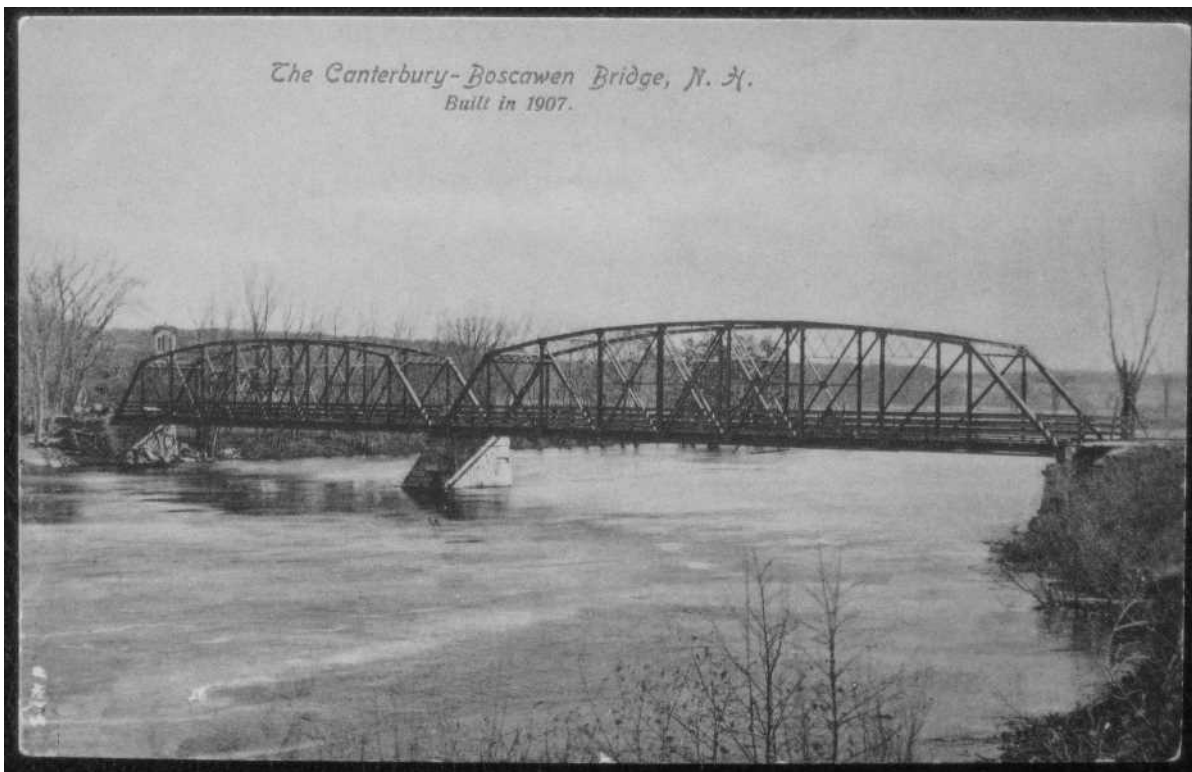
Postcard of steel truss bridge. Photo 1907 or after. Canterbury Historical Society Collection.
